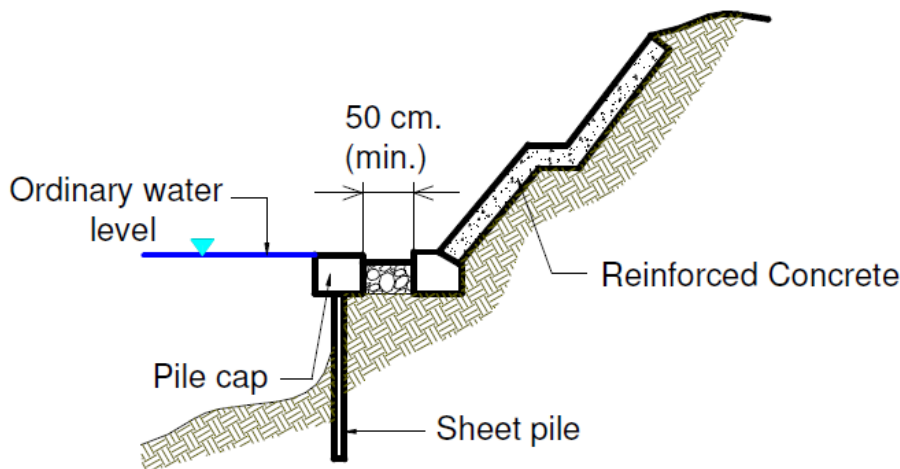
Concrete or steel sheet pile for scour protection<sup>4</sup>.
